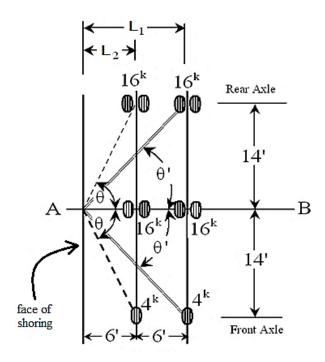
Example problem of HS-20 traffic loads adjacent to excavation
